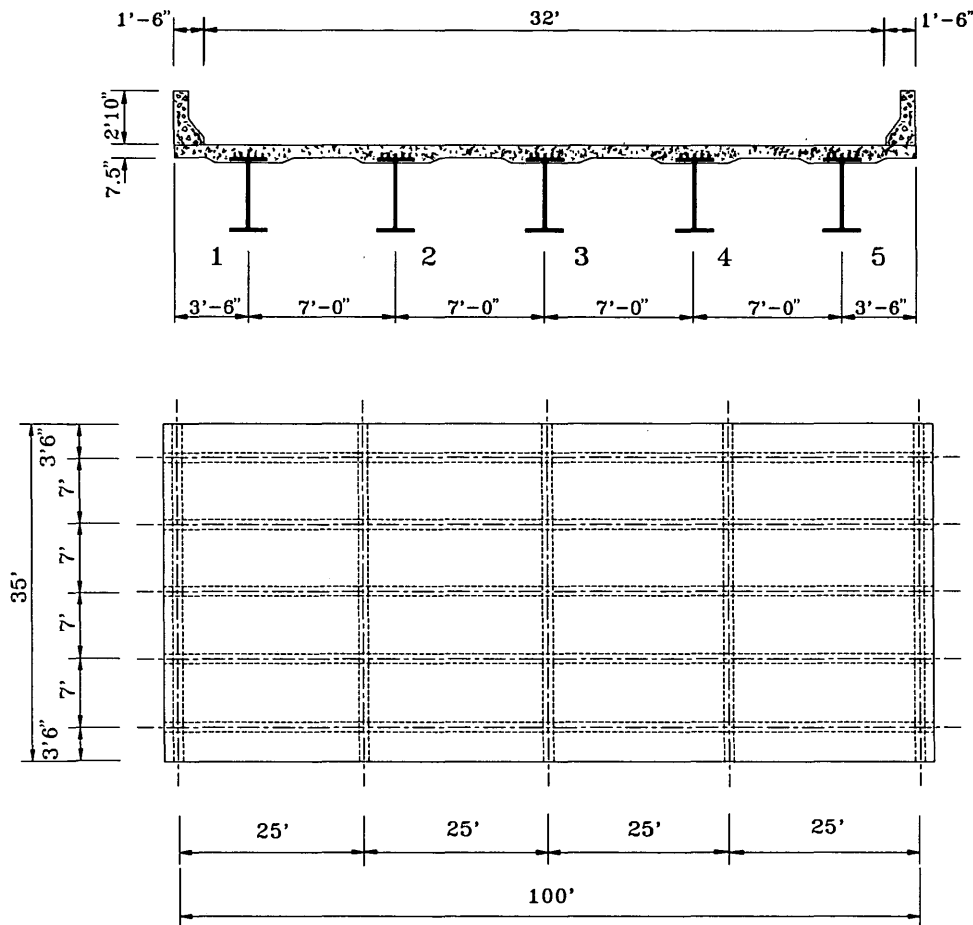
Typical analytical bridge: *top*, typical cross section; *bottom*, typical plan.
